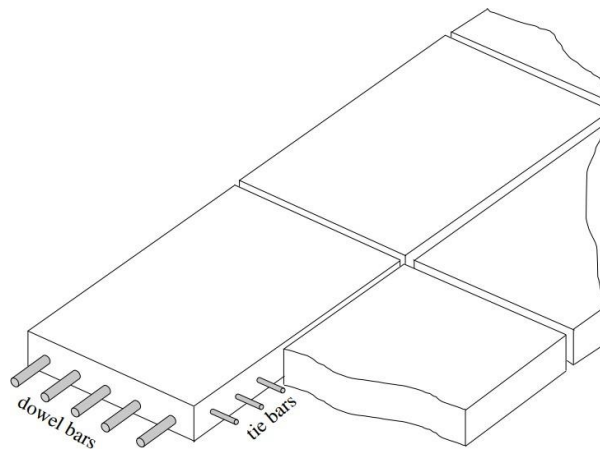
Dowel bar and tie bar arrangement in concrete pavement.
